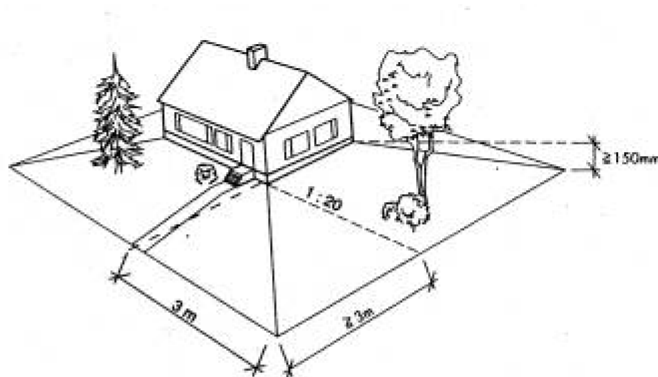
Slope around the building to lead away surface water (Sisäilmäyhdistys ry., 2008)
